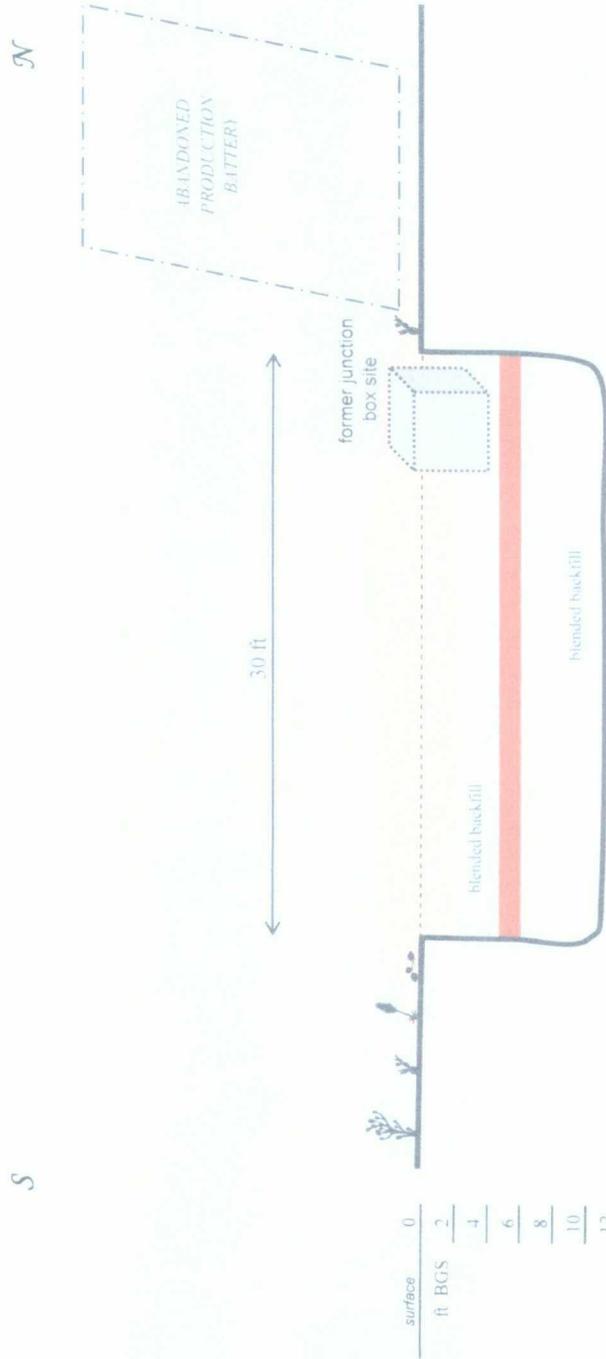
Schematic cross sectional diagram of former junction box and excavation.
